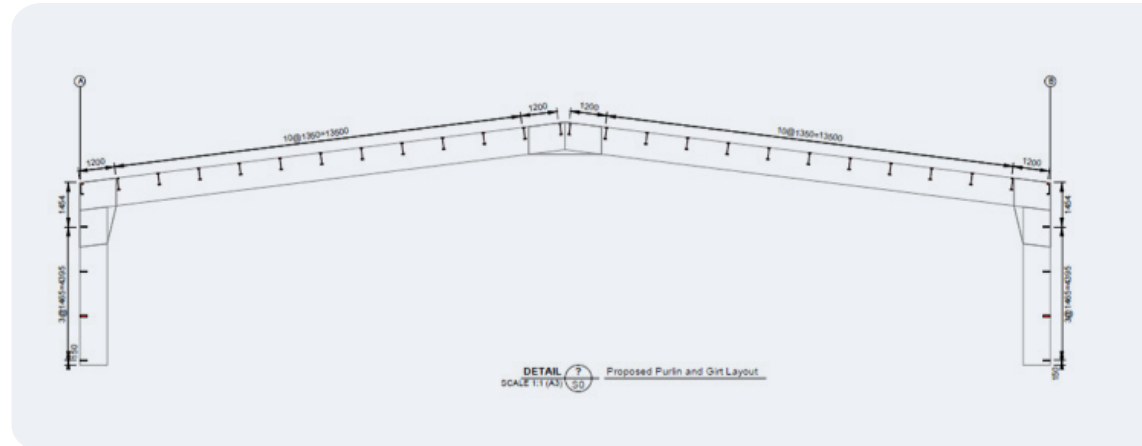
Section of Timber Portal Frame (10.0 m portal spacing shown).
